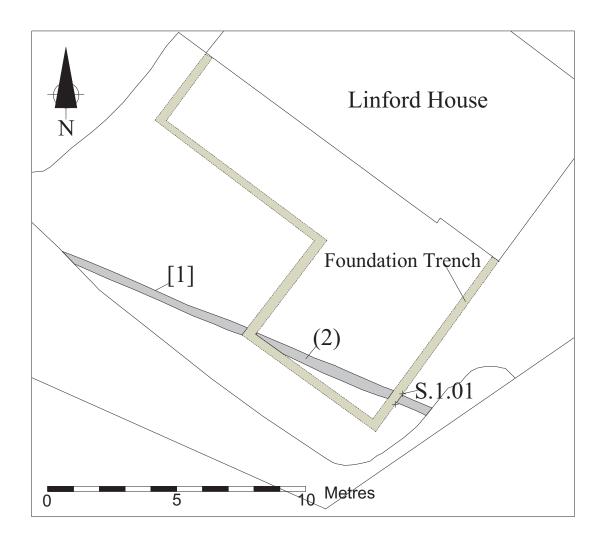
Plan of Site Showing Robber Trench [1], (2). Scale 1:200
